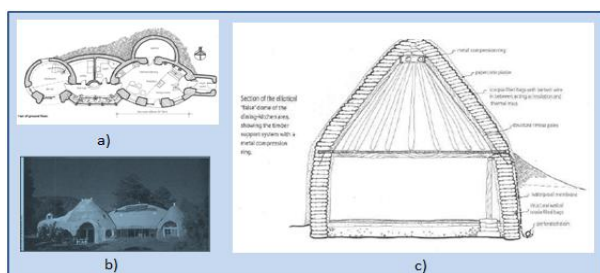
The floor plan (a), pictorial view (b) and longitudinal section (c) of the Hart House
